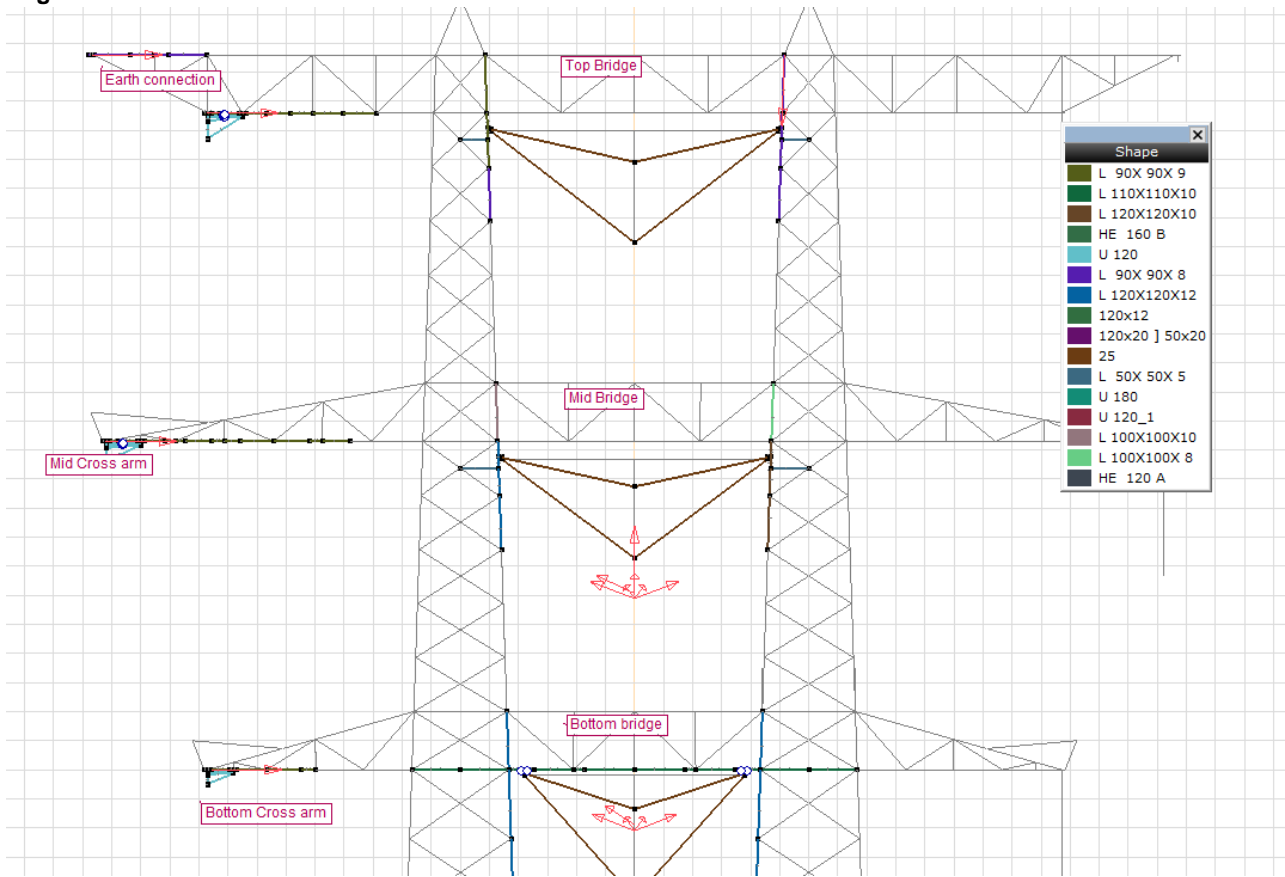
Location of the v-ketting insulator assembly in S-6 tower
